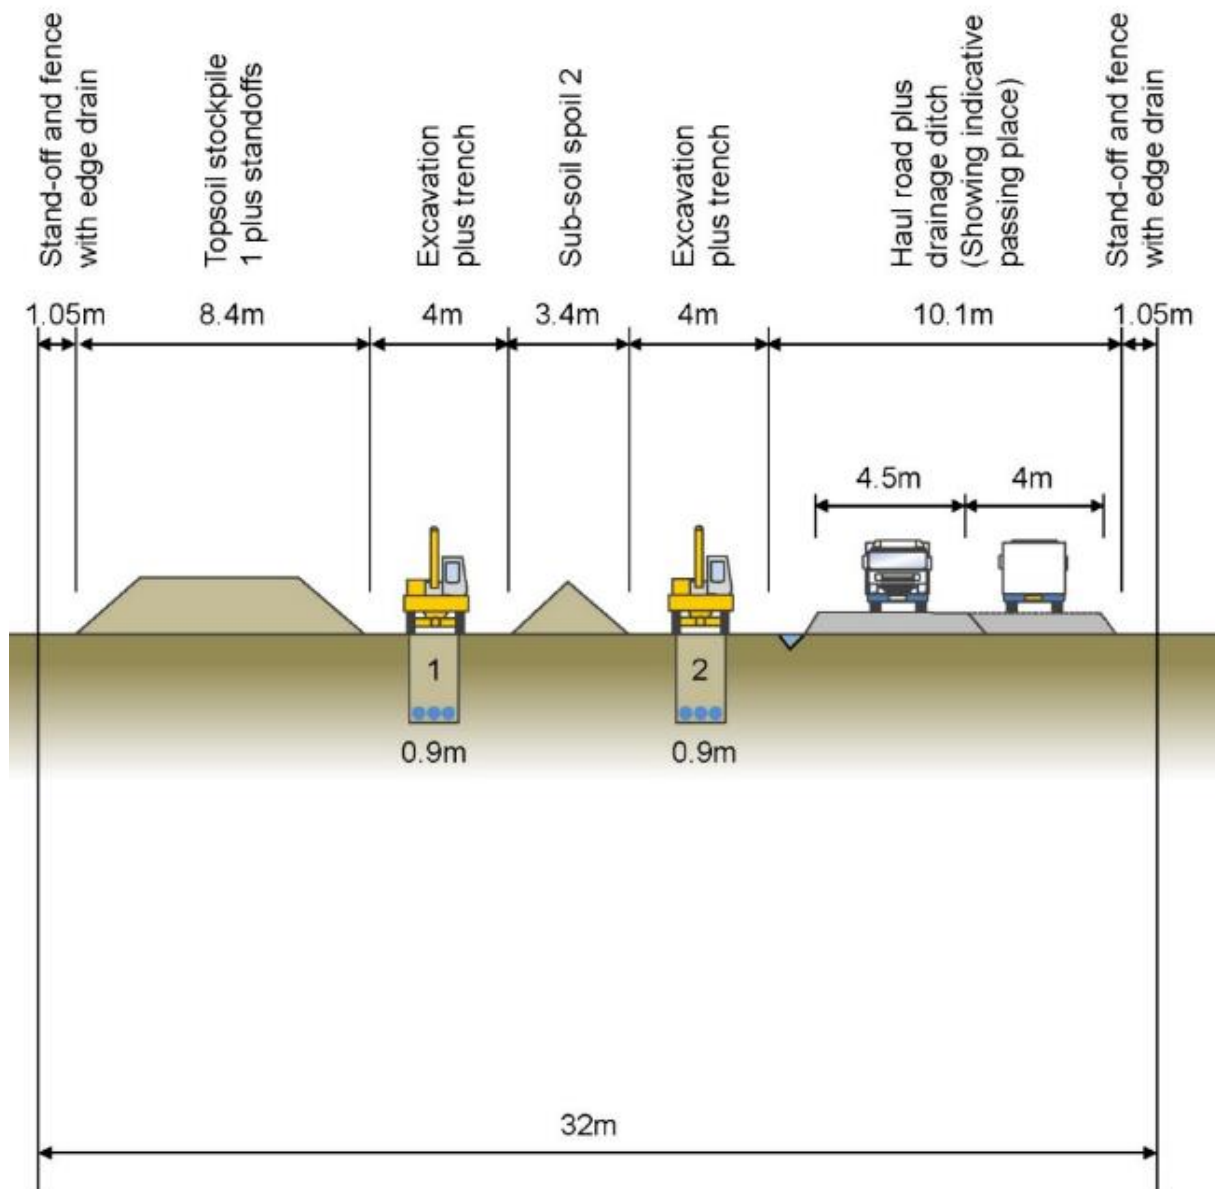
Indicative Cable Trenching Arrangement and Working Area for Typical Onshore Cable Route Width
